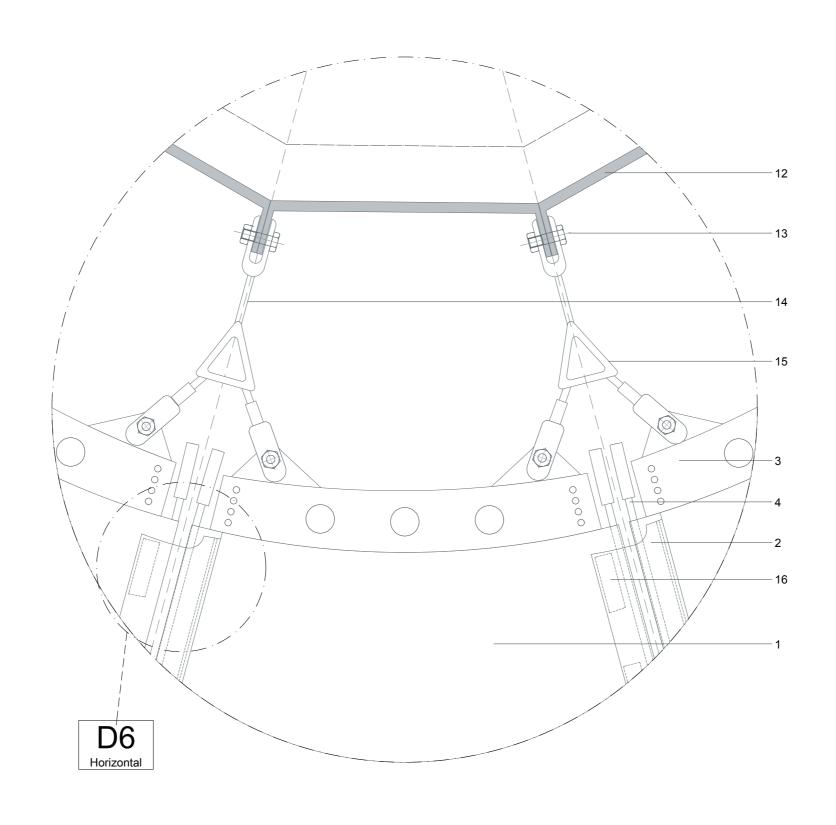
### DETAIL TOP CONSTRUCTION, BAMBOO / MEMBRANE
